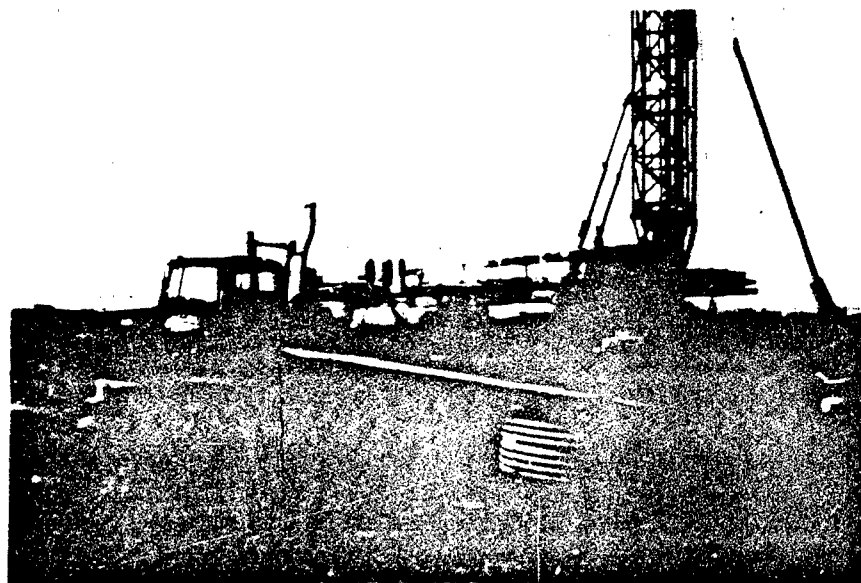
FMC Link-Belt LS-7400 A, used for slurry trench excavation.
